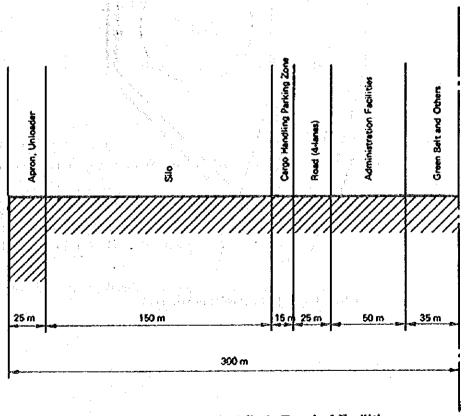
Cross Section of Grain Terminal Facilities
